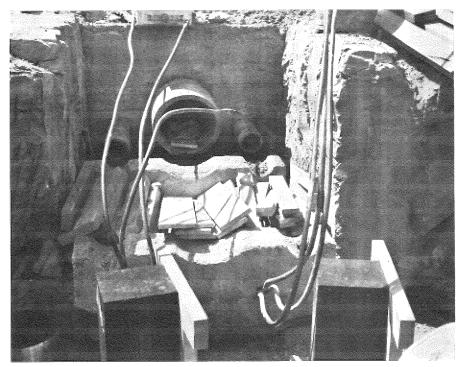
Looking upstream from Manhole A, showing 12-inch and 4-inch tile drains and copper tubing.
